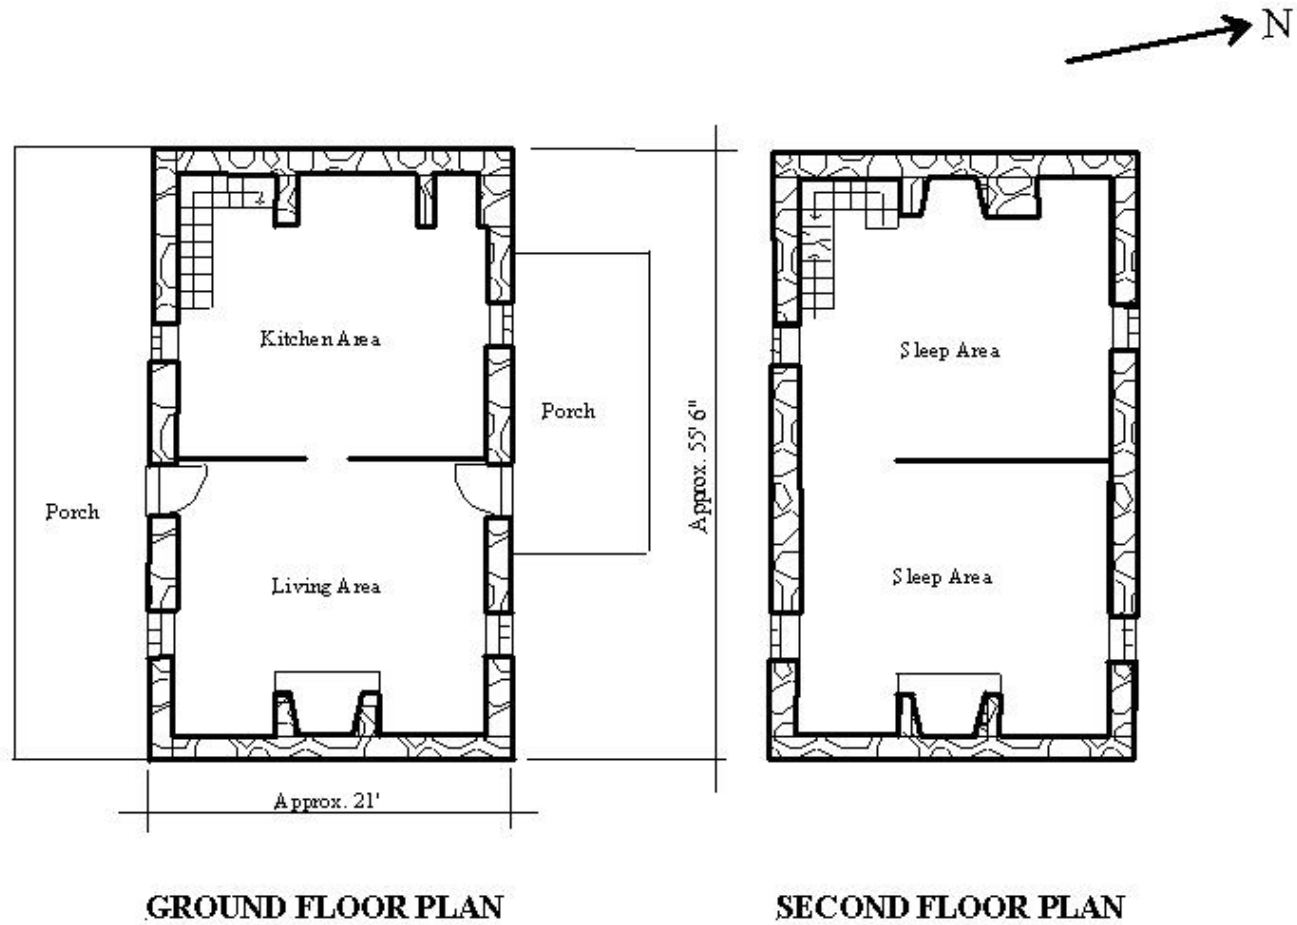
1749 Original Stone Structure- First and Second Floor Plan
